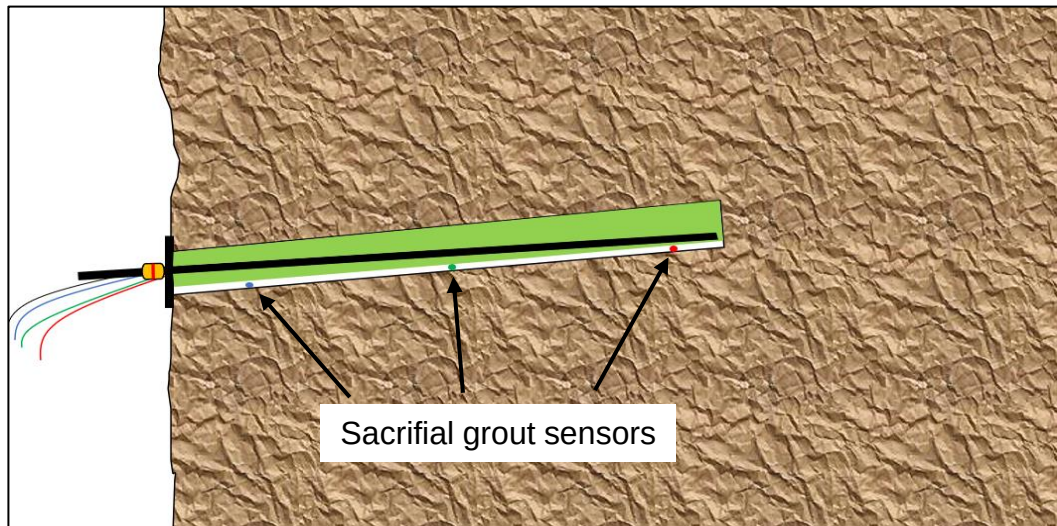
Support hole two-dimensional drawing showing the shrinkage of grout.
